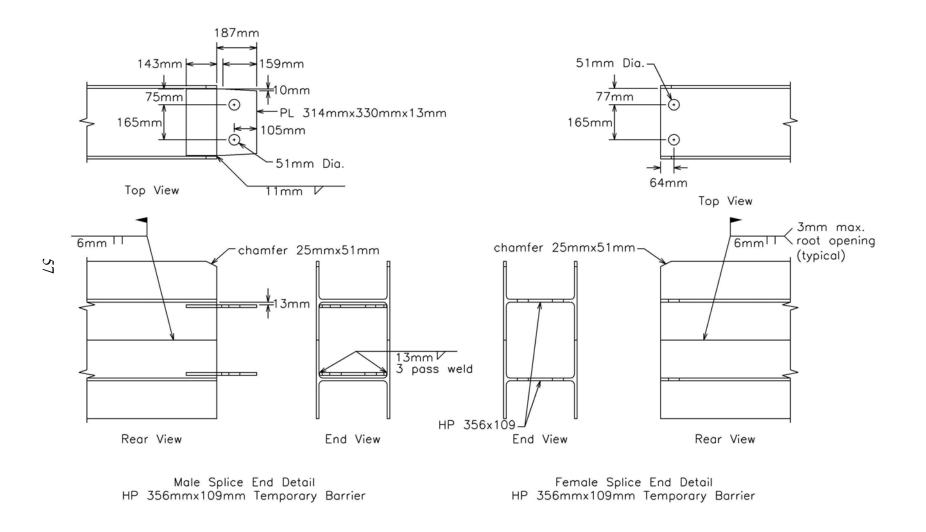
Steel H-section Temporary Barrier End Details (Design No. 2)
